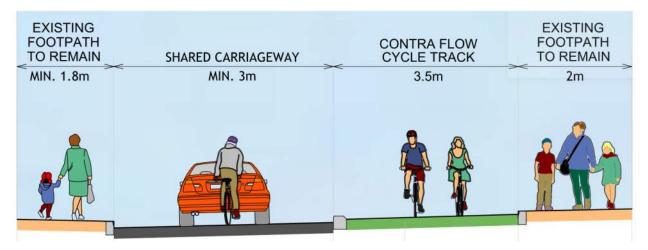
Typical Section 6 Option B Cross Section Mill Lane - Contra Flow
